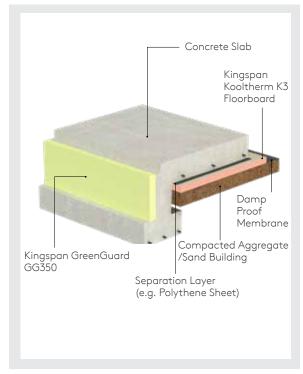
Kingspan Kooltherm K3 Floorboard and Kingspan GreenGuard GG350 as Slab Edge
